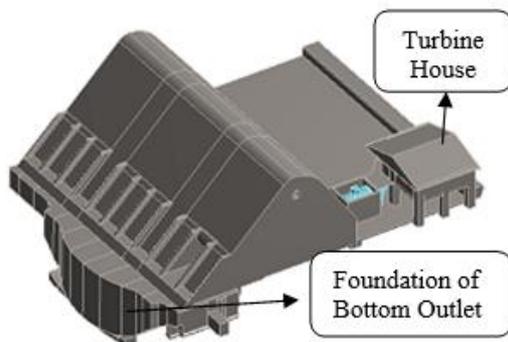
3D model of the bottom outlet section of Chenderoh dam.
